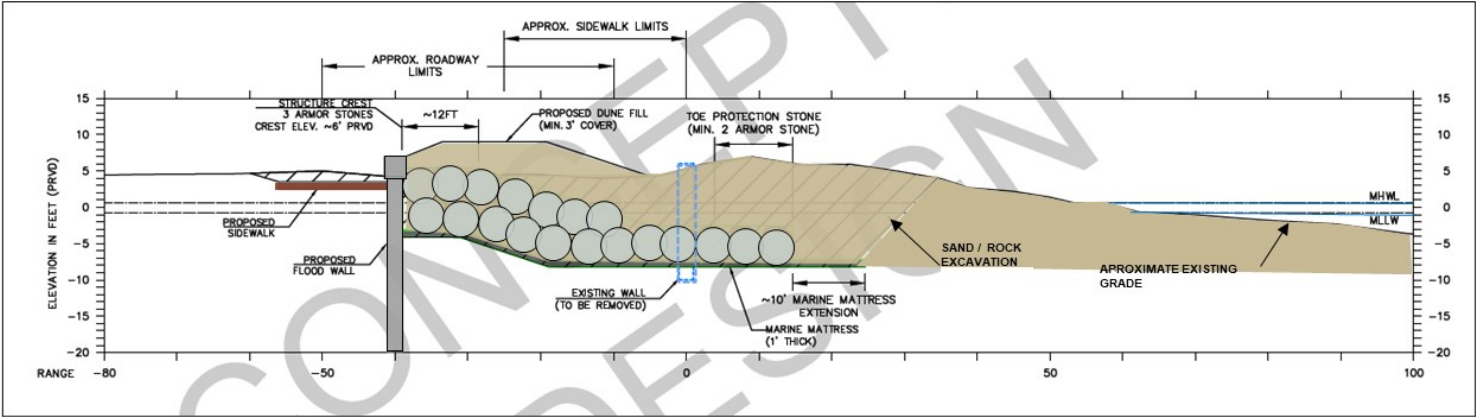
SKATE PARK TYPICAL CROSS SECTION OF SEA WALL, MARINE MATTRESS & TOE STONE
